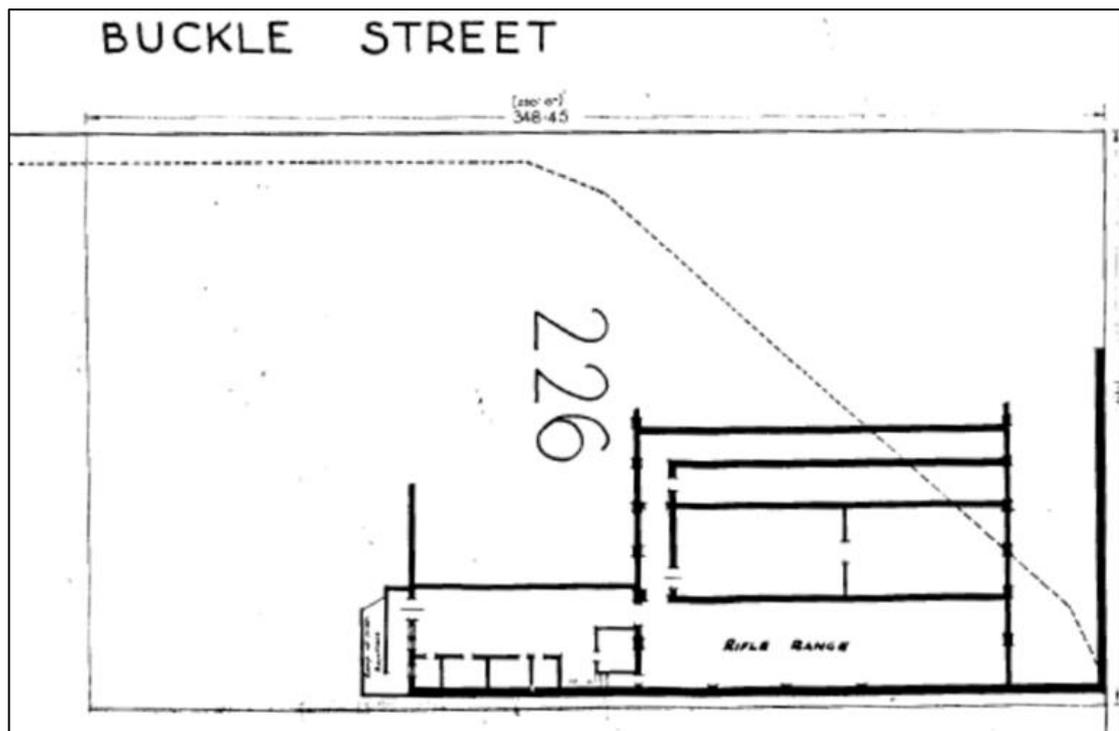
Detail from plan G.2788 Sheet 2 of 4, dated 30 August 1955, showing the basement interior layout of the Wellington Garrison Hall. Source: New Zealand Defence Force Archives
